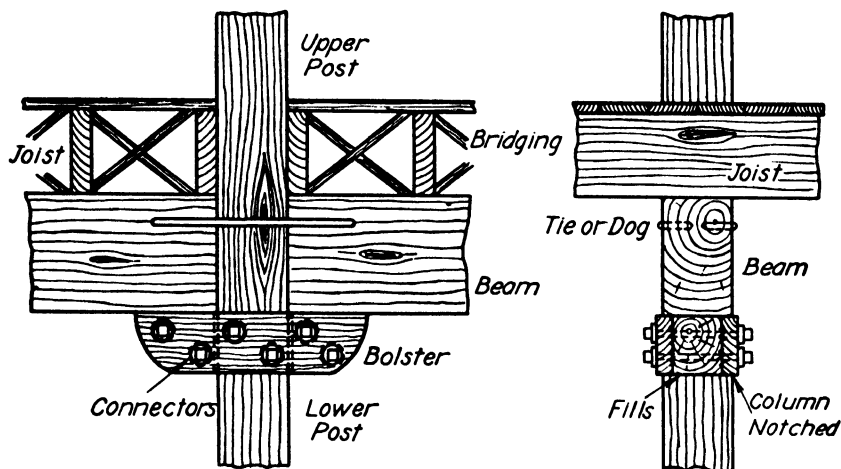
SATISFACTORY STRUCTURAL DETAIL THAT IS WASTEFUL OF HEADROOM.
